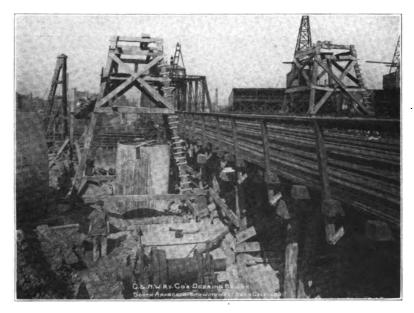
Rear Substructure. Head House in Place for Sinking Cylinder.
